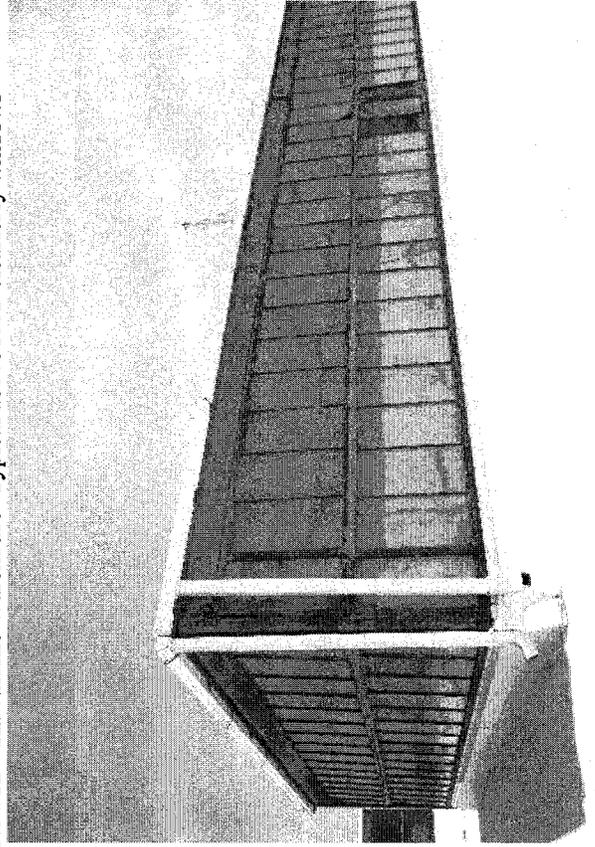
Hawthorne Warehouse -Typical above roof clearstory windows
